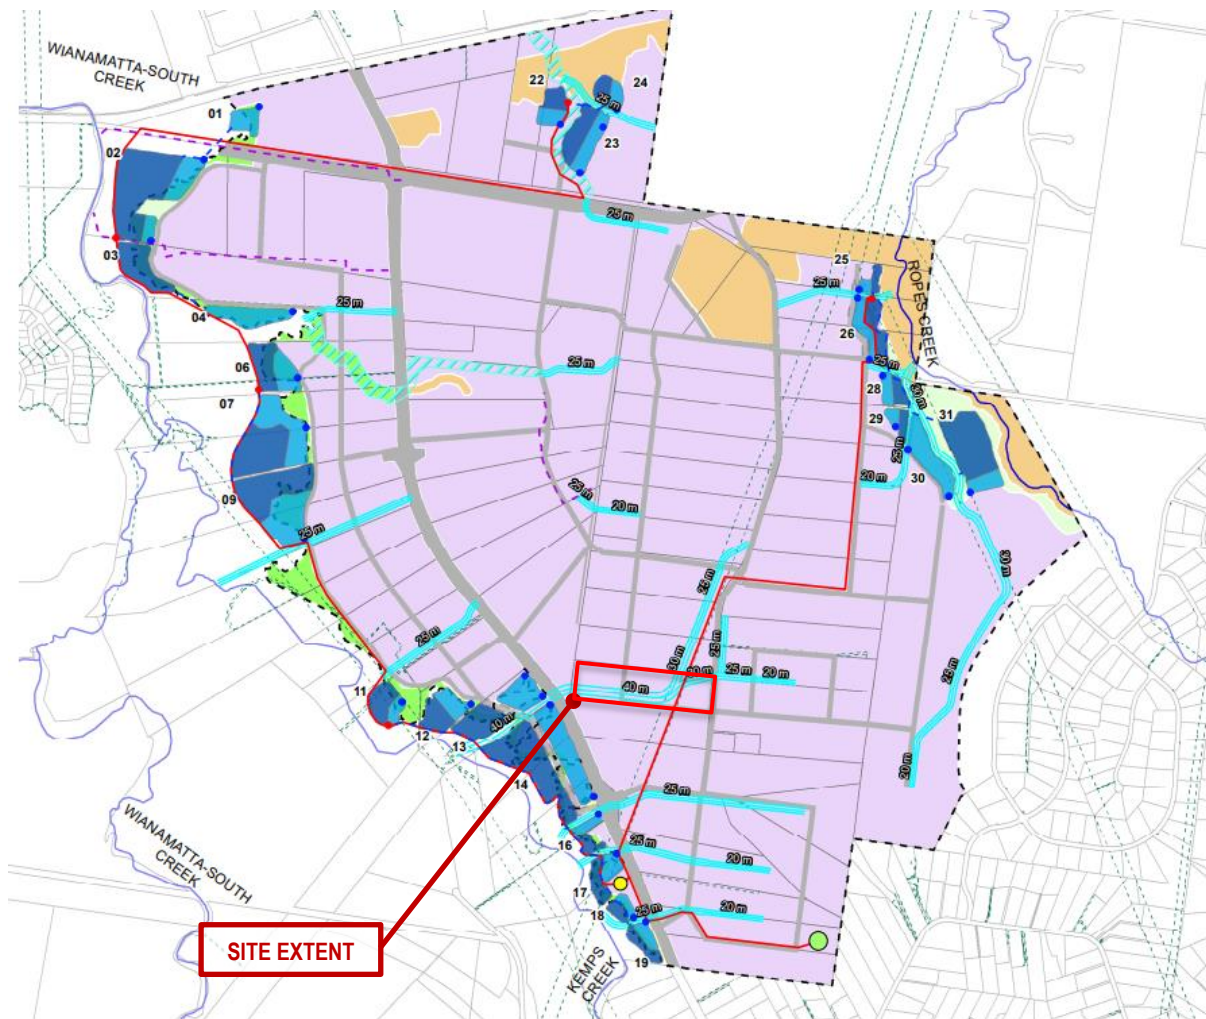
Mamre Road Precinct Stormwater Scheme Plan (Dec 2022, Sydney Water)
